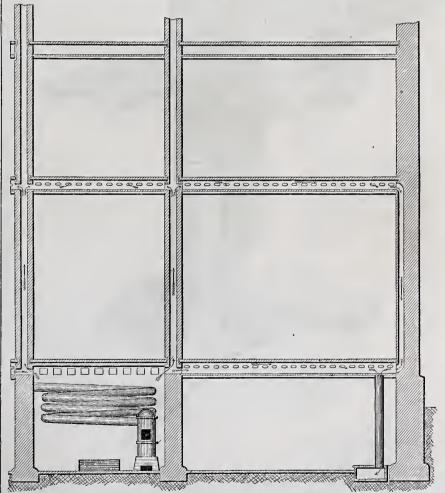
Partial Section Through House, Showing Heating Apparatus and Arrangement of Distributing Flues.
